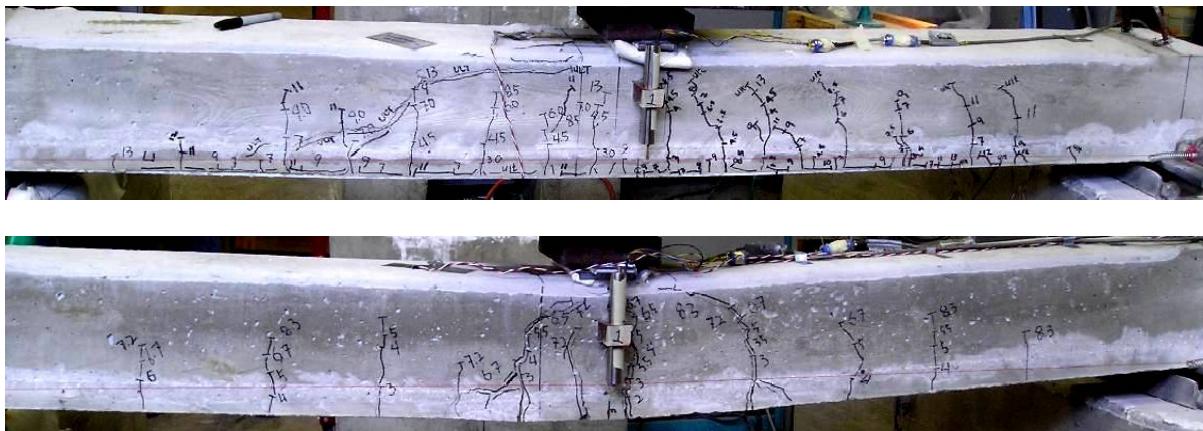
Comparison of cracking in beam at top with FRP form and beam below with uncoated steel reinforcing bars.
